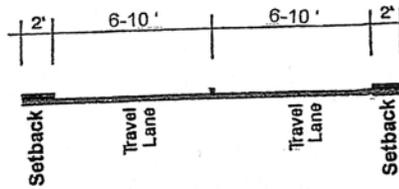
Grove Street Conceptual Standard Cross-Sections
